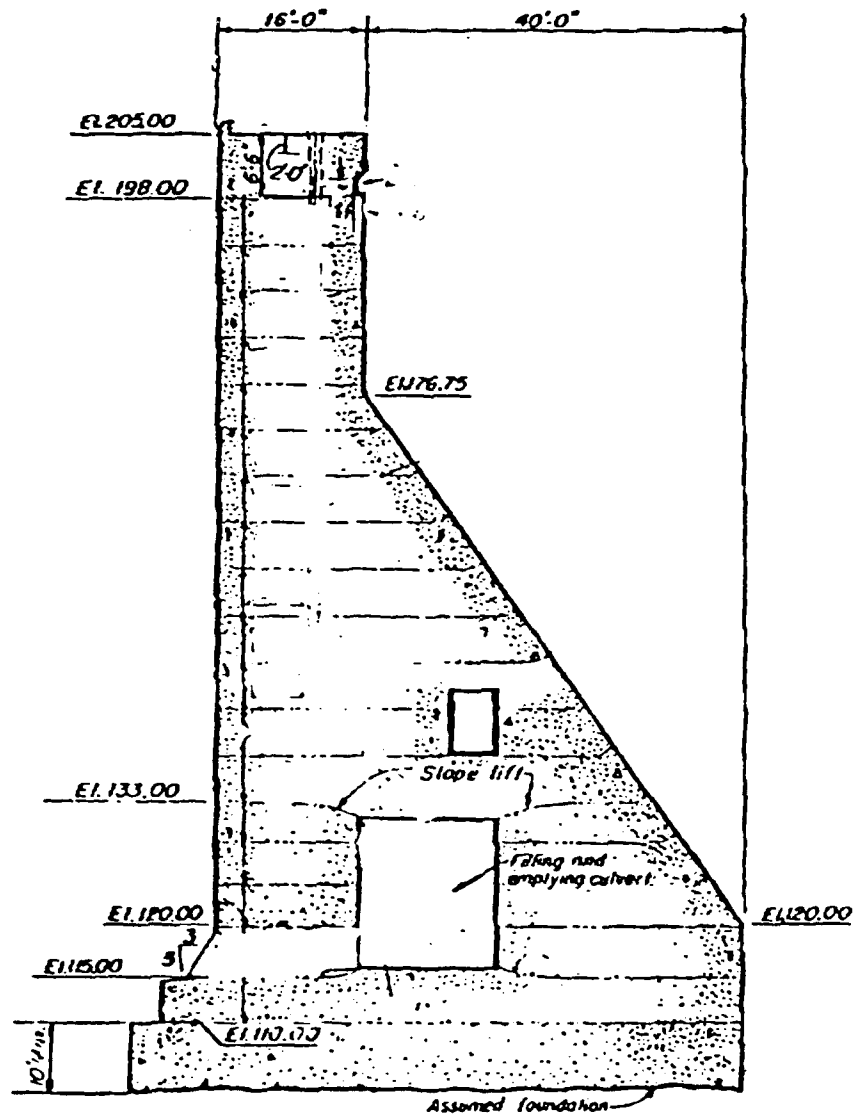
Typical cross section of chamber wall monolith on the south side at Snell Lock
